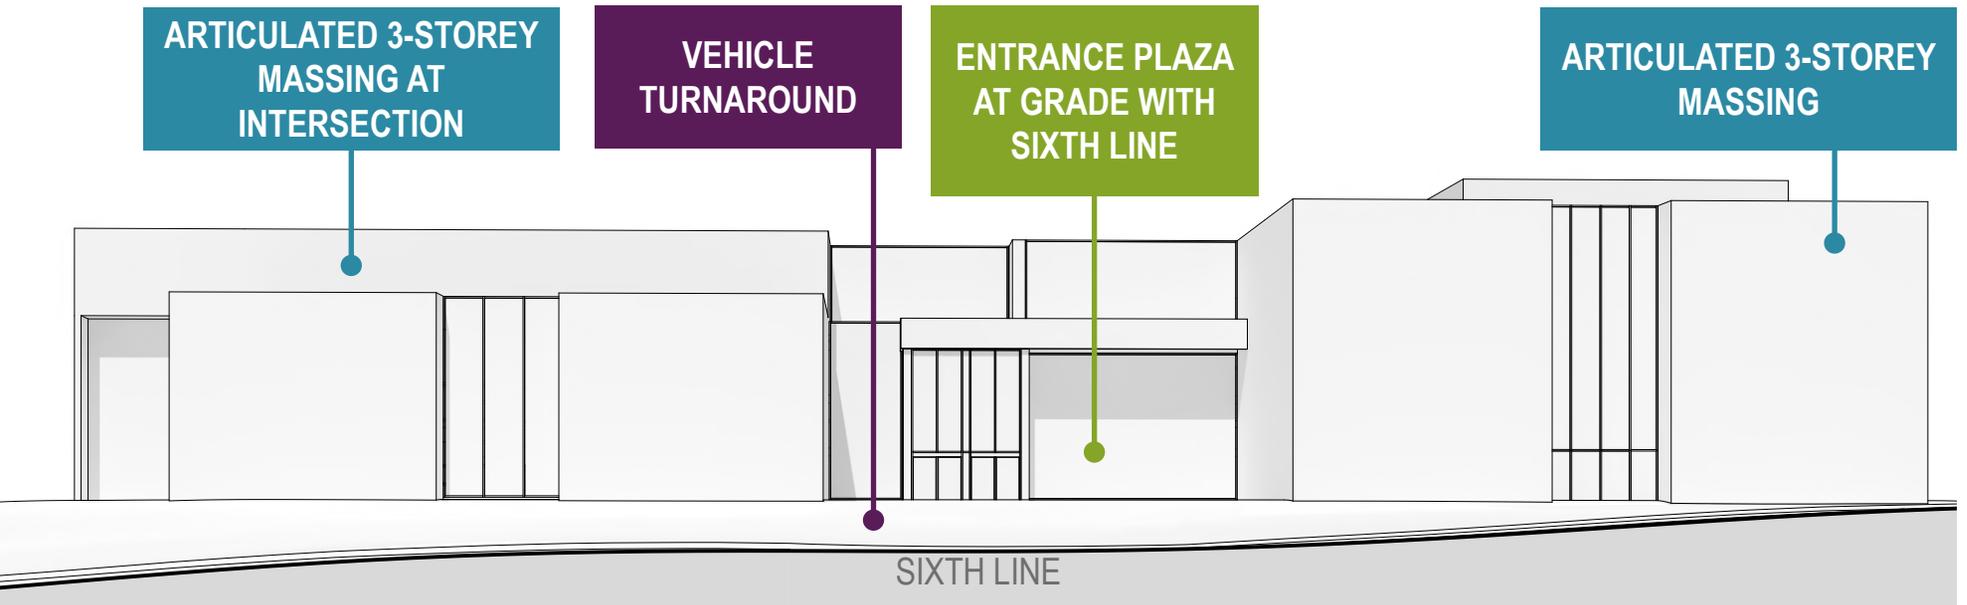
Massing elevation of the proposed school along Sixth Line
